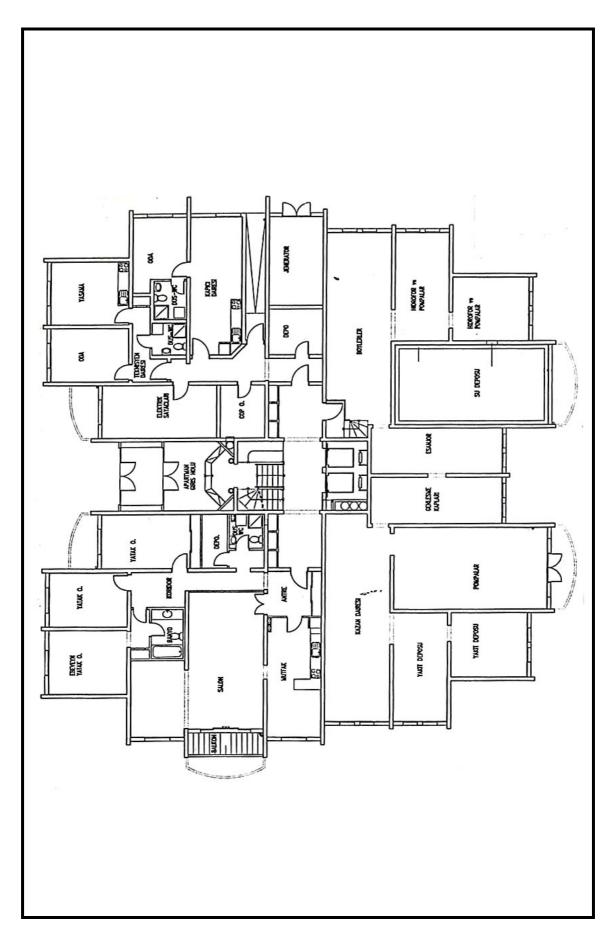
Mavişehir II; Albatros Ground Floor Plan
